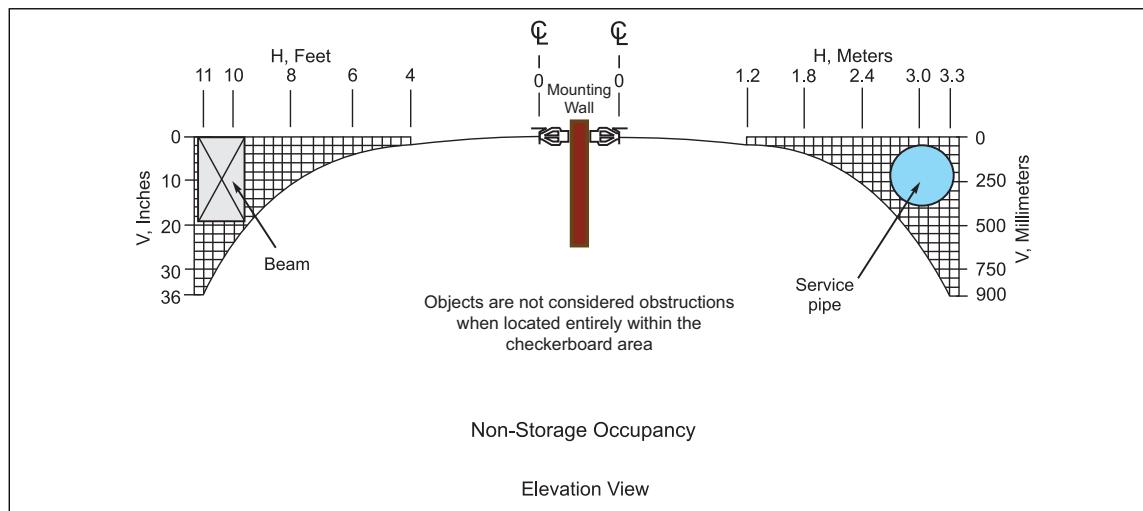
(a). Objects near ceiling level not considered obstructions to standard-coverage Nonstorage sidewall sprinklers away from the mounting wall
